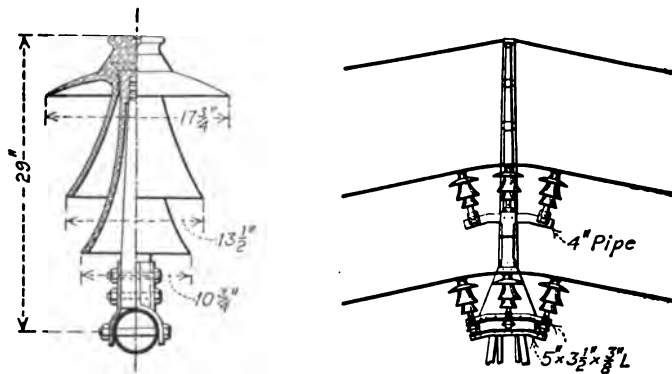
MEXICAN LIGHT AND POWER CO. TOP OF SPECIAL TOWER AND SECTION OF 85,000-VOLT INSULATOR
